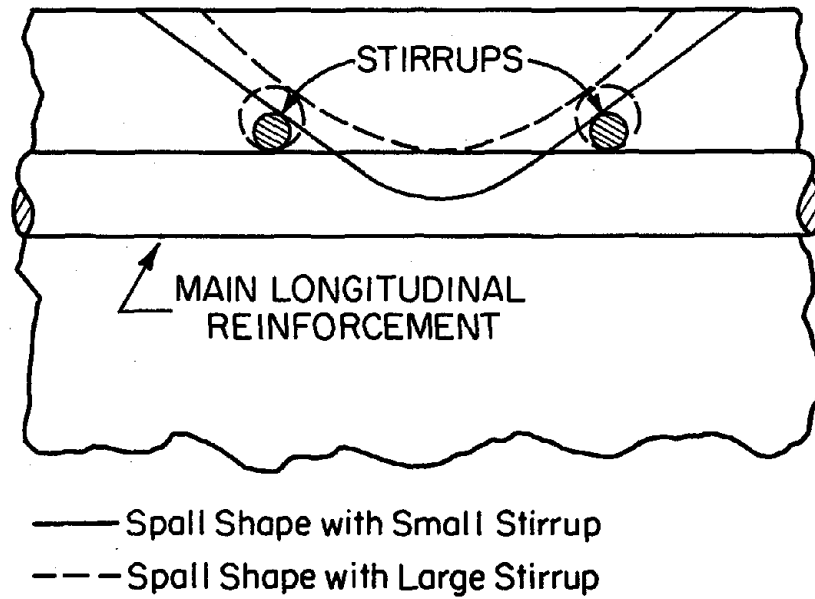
Characteristics of Spalling Illustrate Benefits of Large Stirrup in Denying Penetration of Core Concrete.
